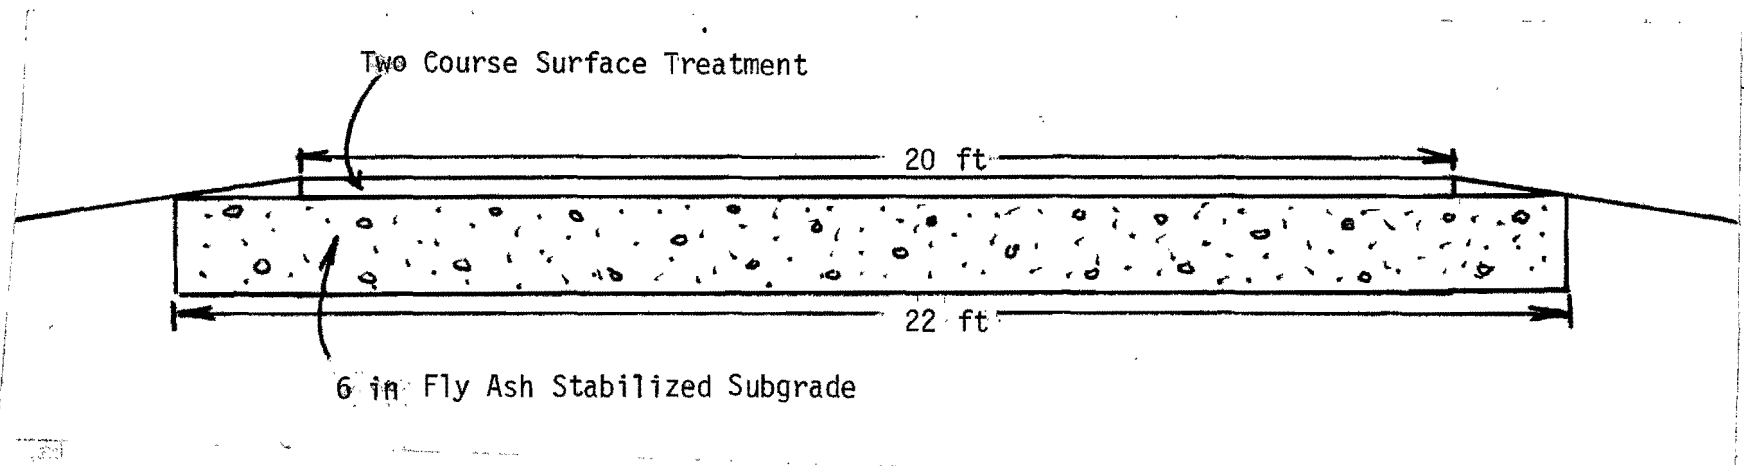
Typical Section of FM 2697 in Wheeler County, Texas (Test Site No. 12)
